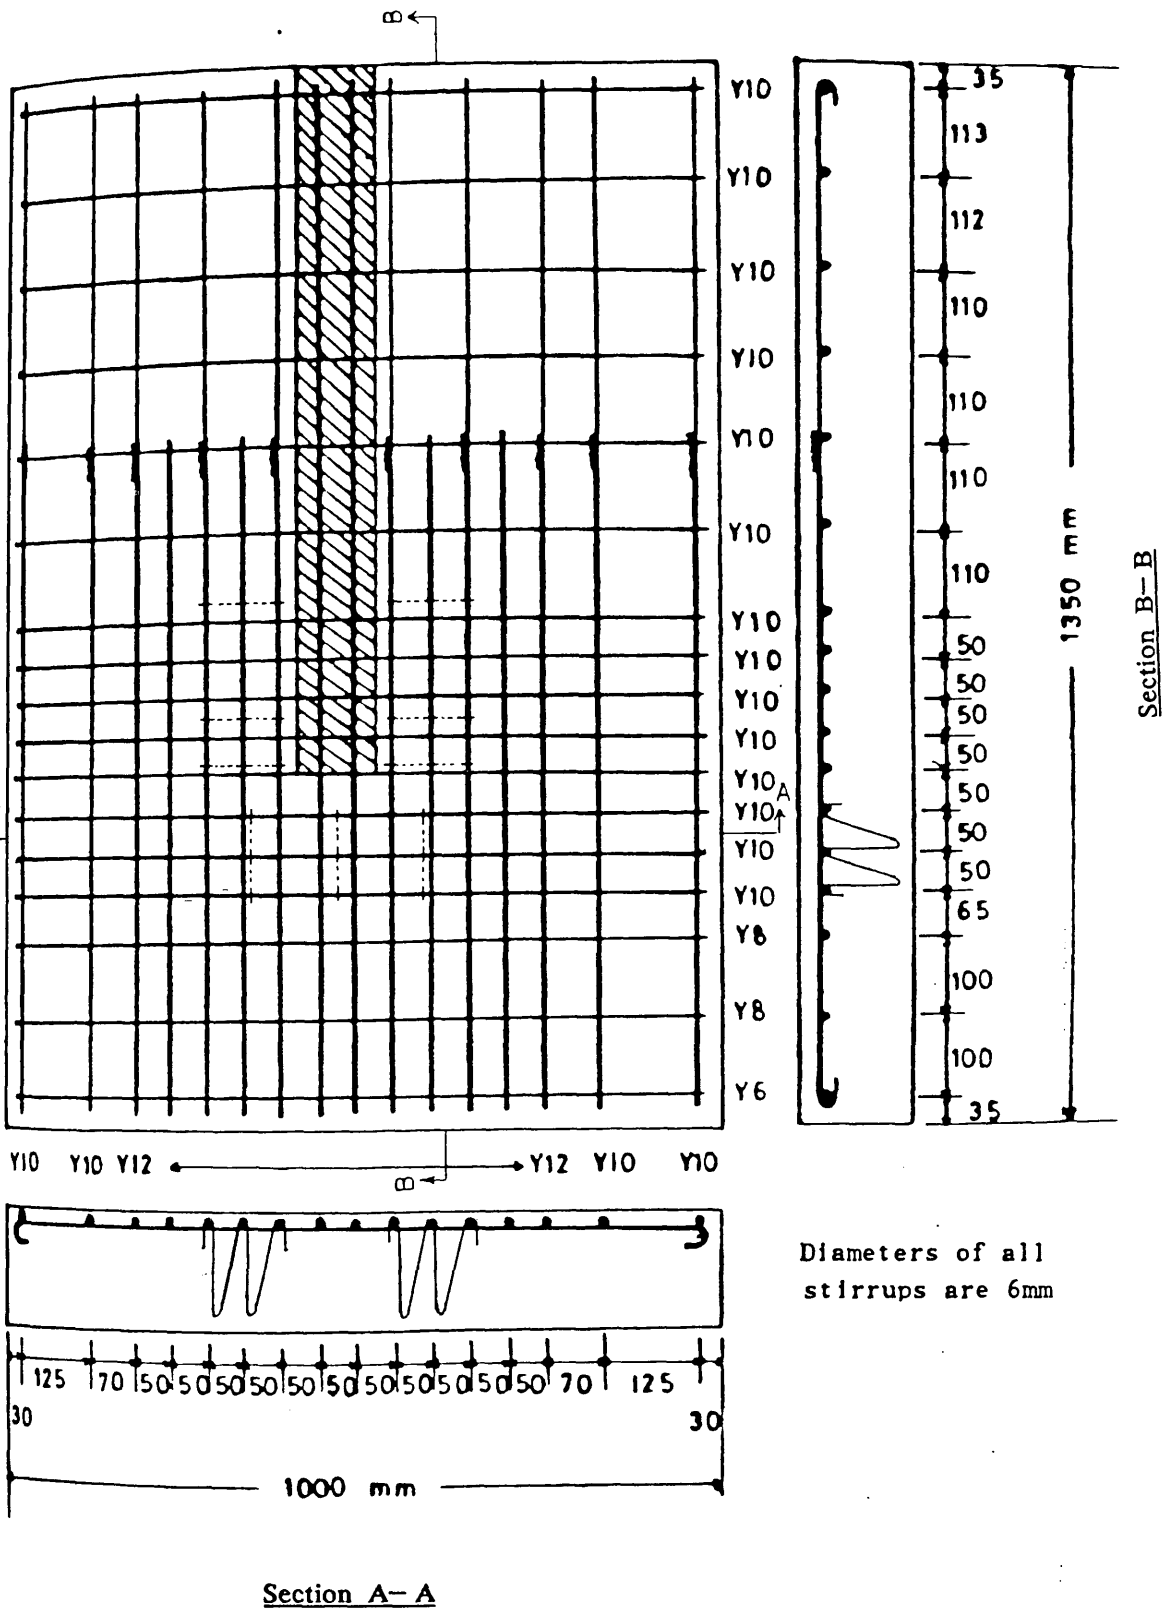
Arrangement of reinforcing bars including shear steel in the slab of model PS1
